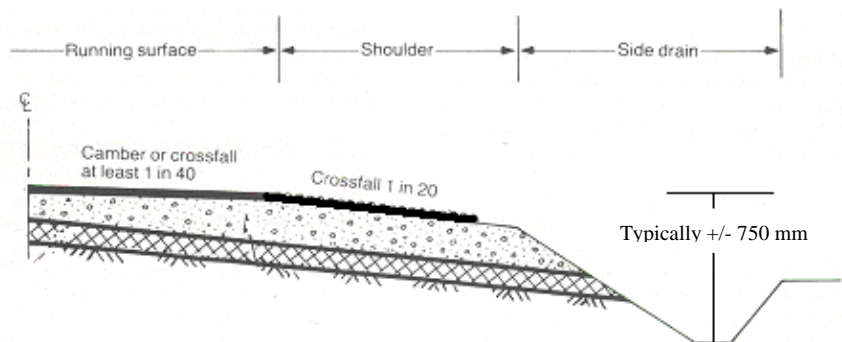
Ideal shoulder construction/drainage arrangements
